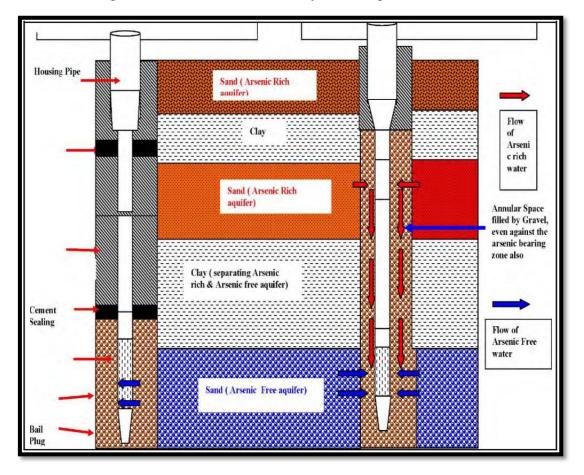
Tube-well design of a deep tube well tapping safe deeper aquifer
